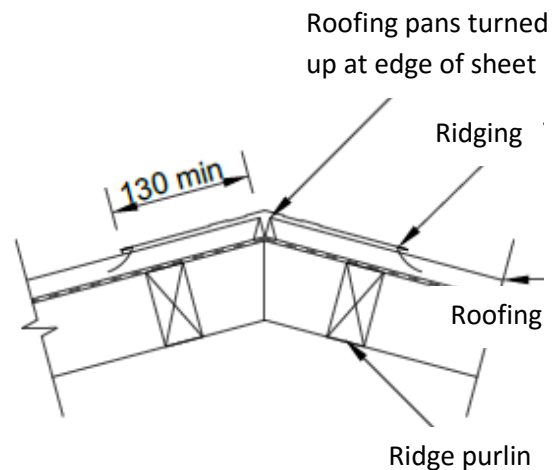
Roof ridging detail (used with permission from Versatile Homes and Buildings)
